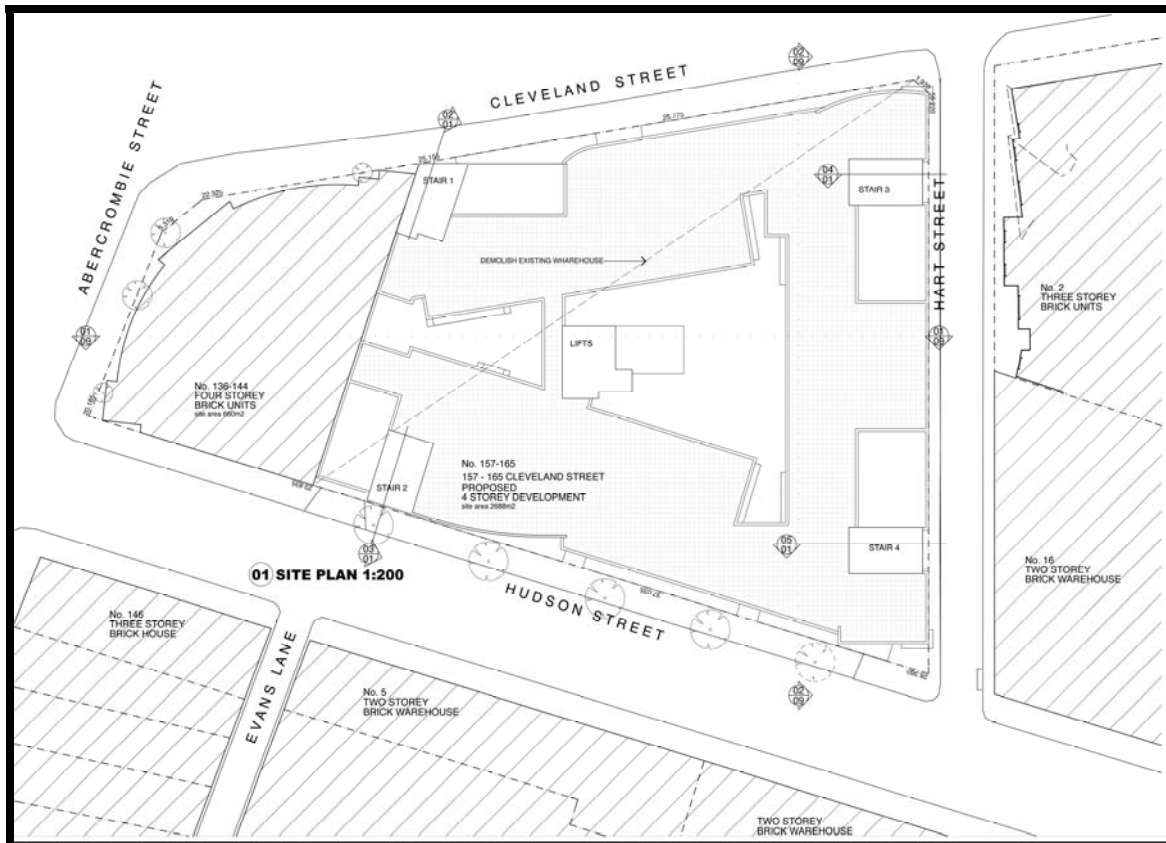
Site plan of existing subject site. (Source: Fortey + Grant Architecture, 2010)
